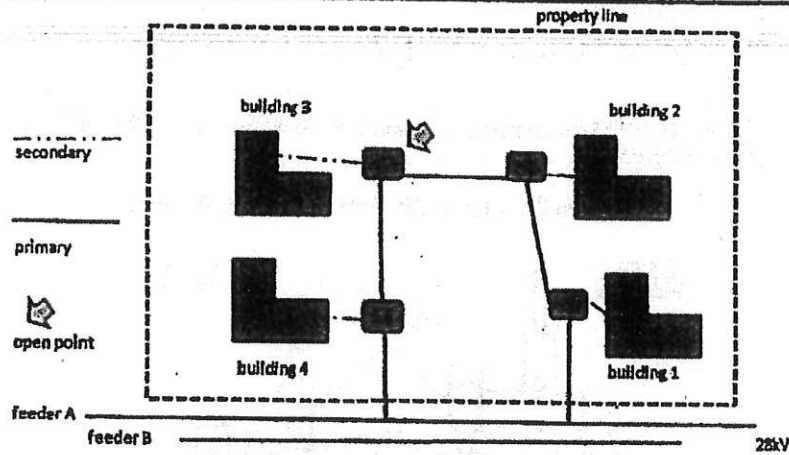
MULTI BUILDING CONNECTION greater than 1,000kVA
